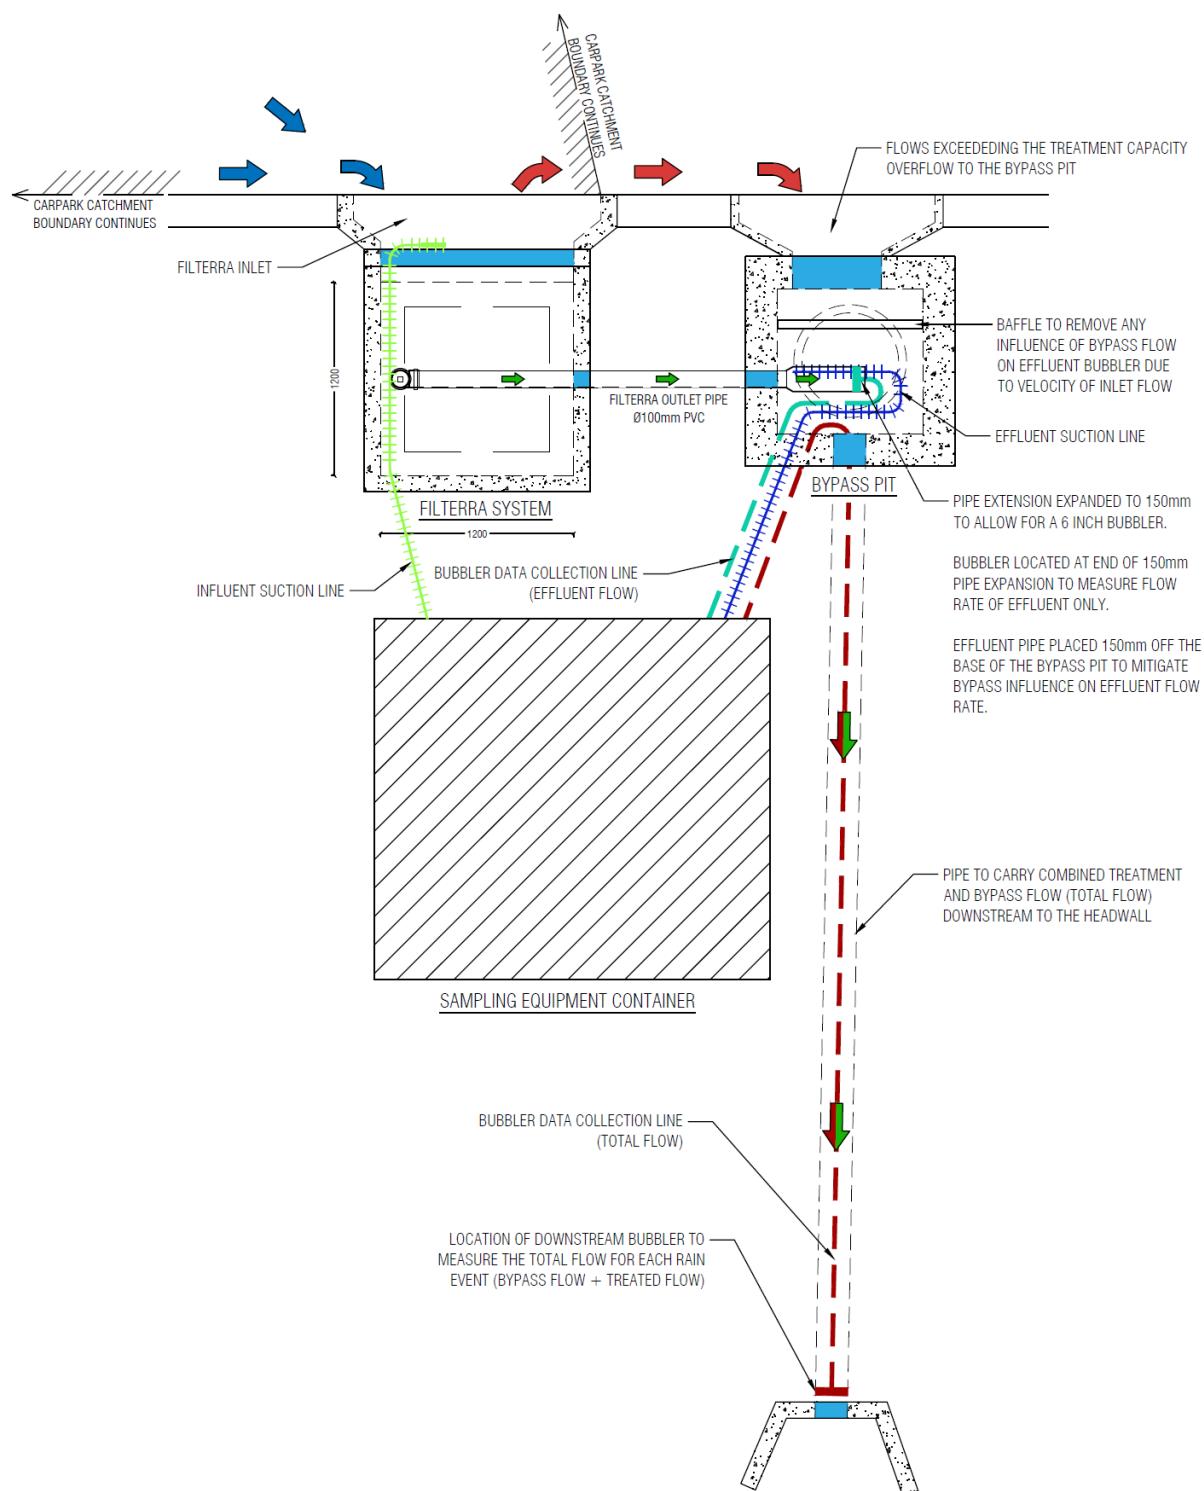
Schematic plan drawing of Filterra® biofiltration system at site
